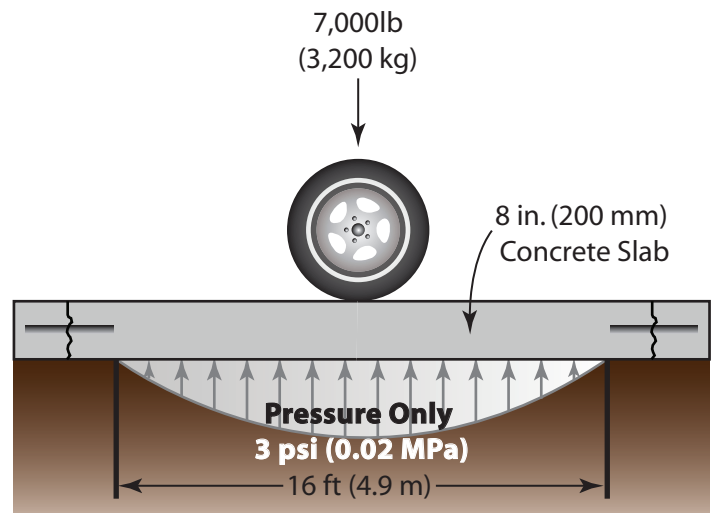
The rigidity of concrete helps a concrete pavement distribute wheel loads over large areas, keeping subbase/subgrade pressures low.
